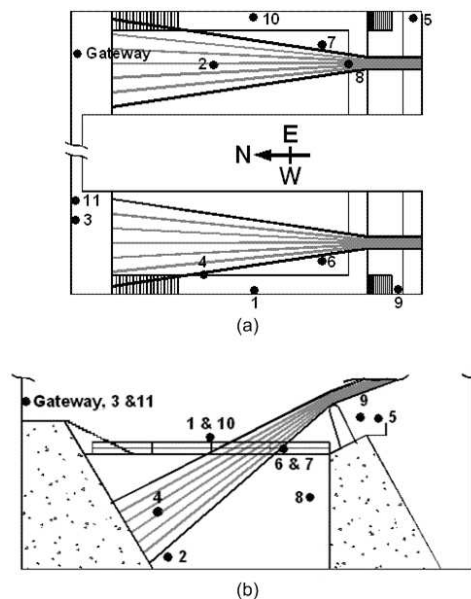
Layout of the WSN at the Hesse Anchorage of the Humber Bridge: (a) Plan view of the WSN; (b) Elevation view of the WSN.
